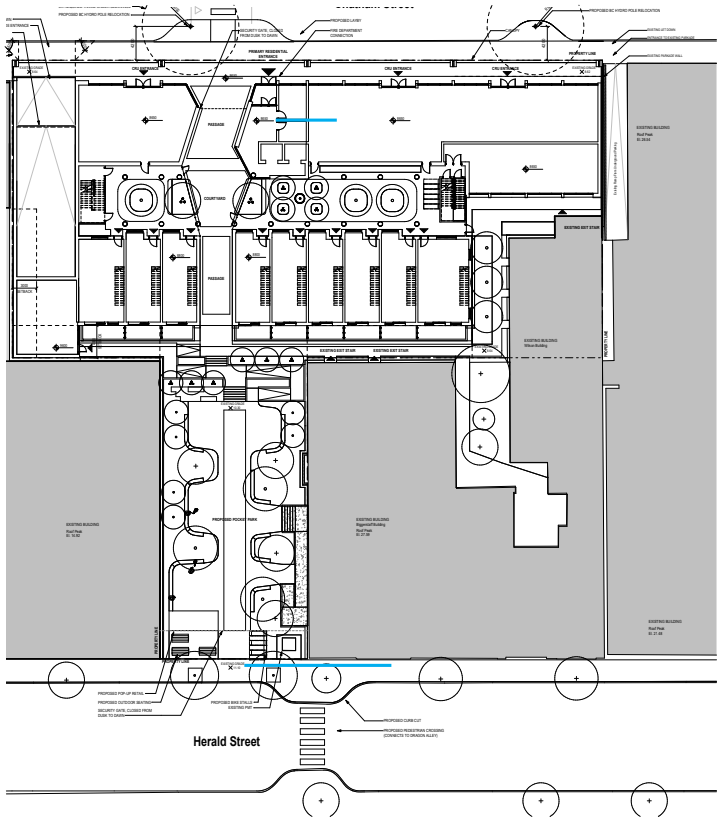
Site Plan indicating proposed gates at the north and south ends of site, to be closed from dusk to dawn.
